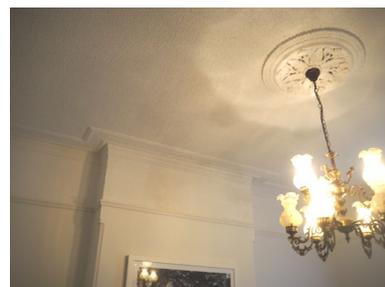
72: Detail of original cornice, picture rail and ceiling rose to living room.
